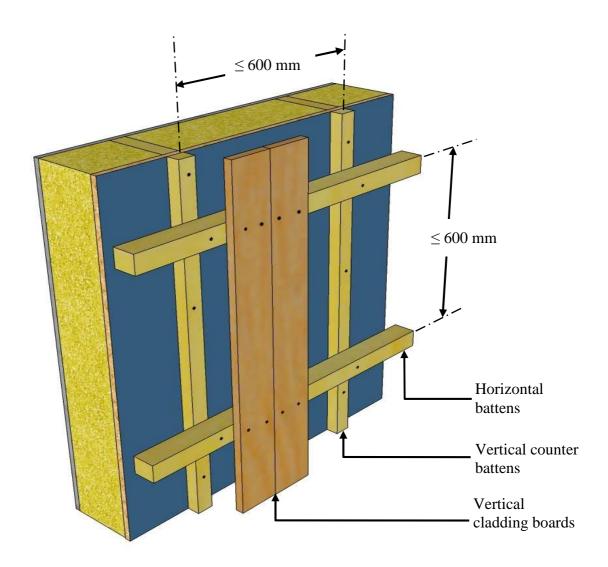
Typical installation assembly and fixings for vertical timber cladding
